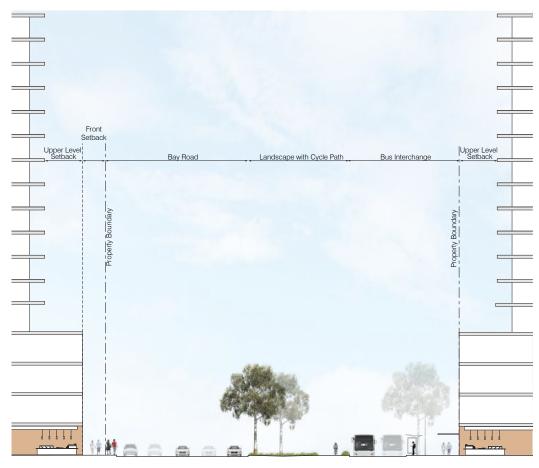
Section A - Illustration of potential typical section of Bay Road and built form interface
